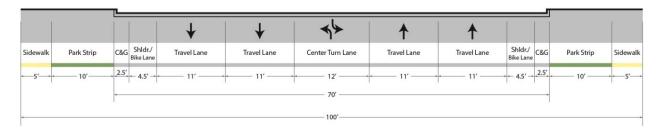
Cross Section, Minor Arterial (Five Lane)
